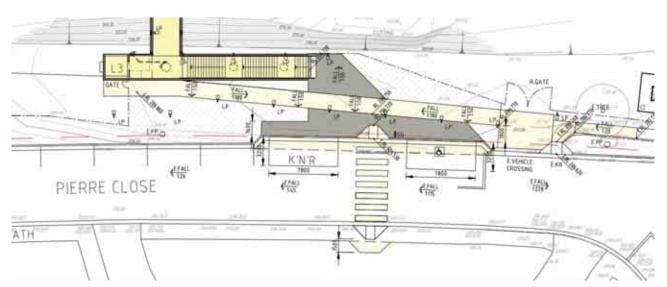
Access arrangement to Lift 3 and Stair 3 from Pierre Close (including new kiss 'n' ride and disabled car parking)
